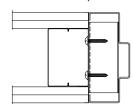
A illustrates a steel stud *anchor* which is welded to the back of the jamb and attached to the steel stud by welding or mechanical fasteners. Figure 8B shows a steel stud *anchor* which may be welded or friction fitted inside the jamb profile. Both are eligible for use in welded and *knocked-down* frames up to 3 hour rating. Figures 8C and 8D are for welded frame product up to 1½ hour rating, end-butted in steel stud partitions. Figure 8C illustrates new steel stud partition applications, and Figure 8D, existing partitions. For new steel stud applications (Figure 8C) *anchors* are welded to the back of each jamb 6" (152 mm) from each end and at 24" (610 mm) on center (maximum) and secured to the stud by welding or mechanical fasteners. For existing steel stud installations (Figure 8D) *anchors* are welded in jambs and heads pierced and dimpled for ½" (6 mm) diameter sheet metal screws not more than 6" (152 mm) from each end and 24" (610 mm) on center maximum.
